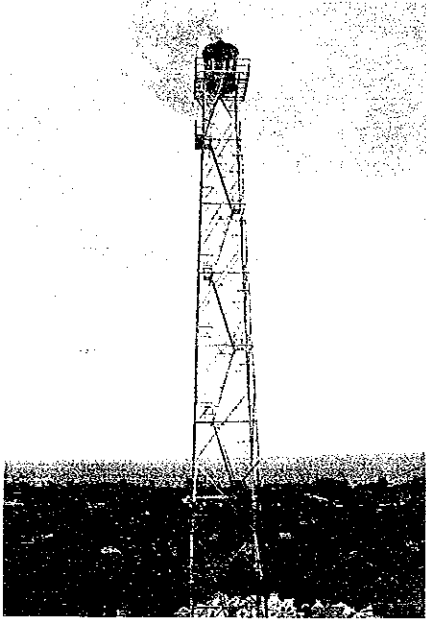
Steel Tower Locates in Southern Hill Side Area; Non Damaged
